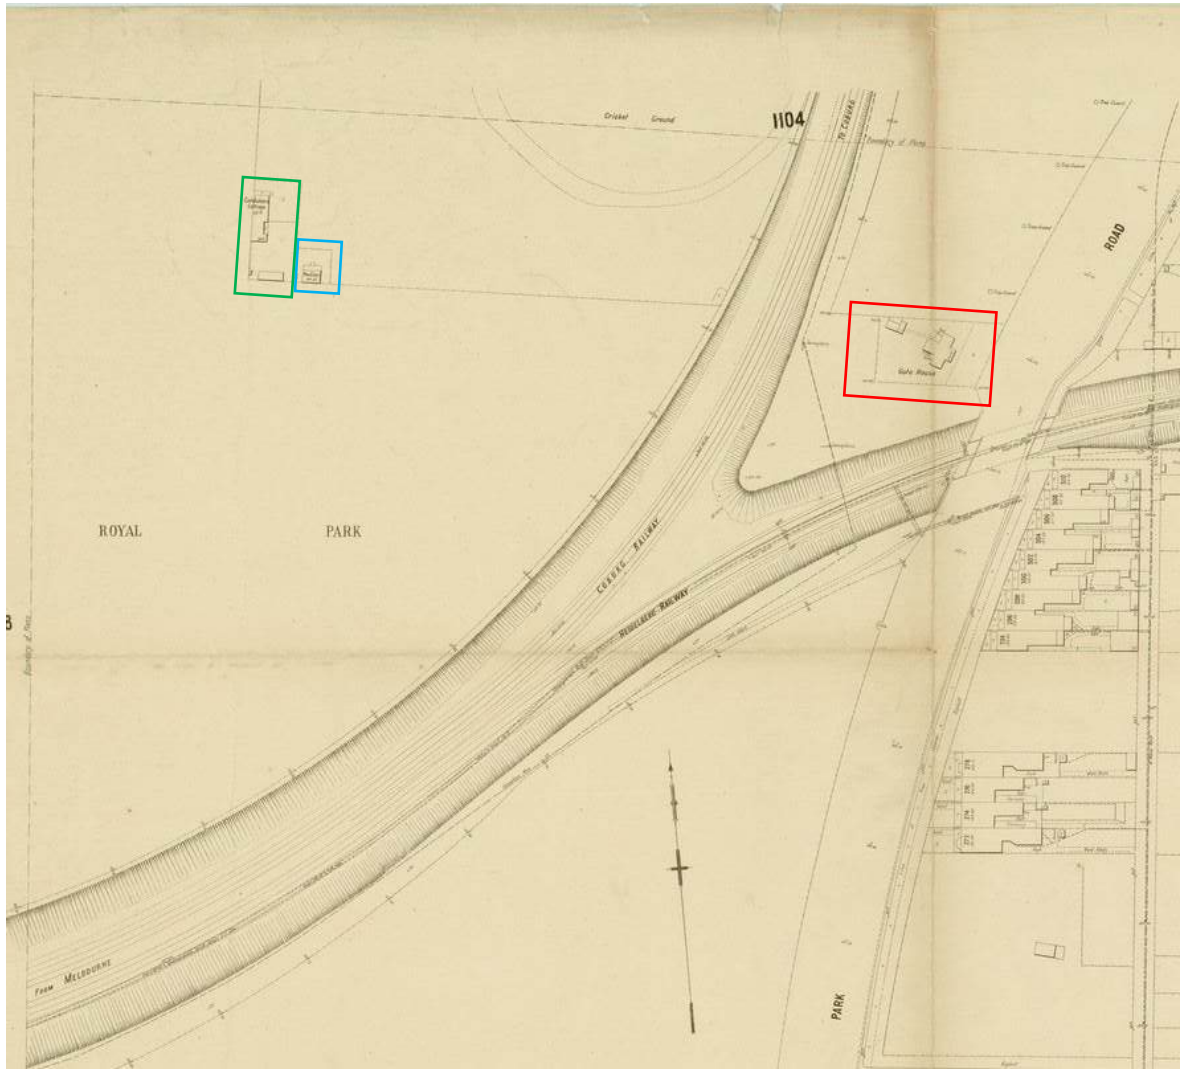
1902 MMBW plan No 1117 demonstrating the location of the Royal Park junction, gate house with associated out building (in red) and buildings associated with the cricket ground (original in blue, additions in green), oriented north (SLV)
